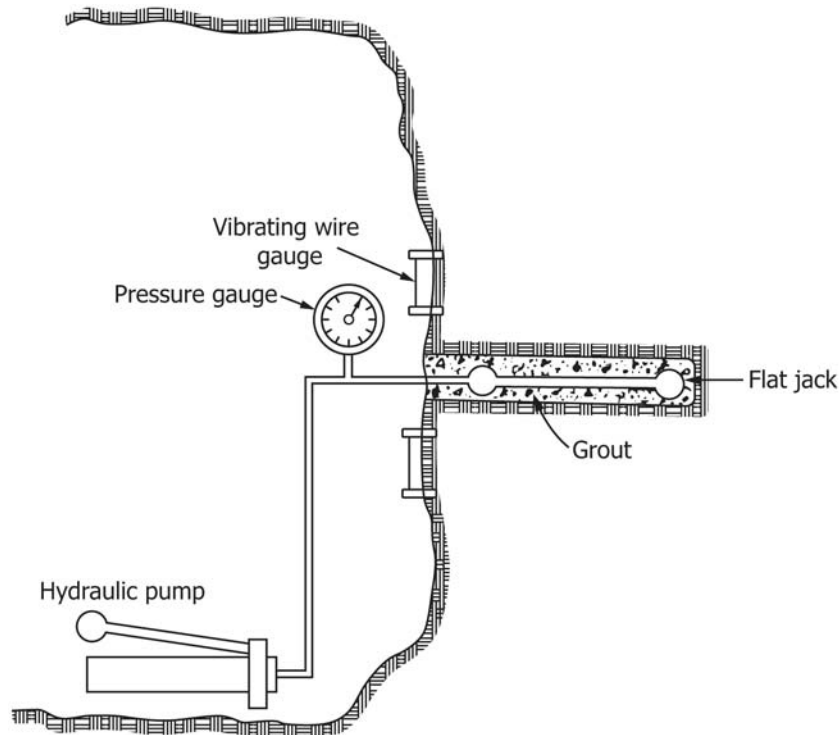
General Diagram of Flat Jack Test Apparatus with Flat Jack Installed in the Tunnel Wall and Vibrating Wire Displacement Gauges
